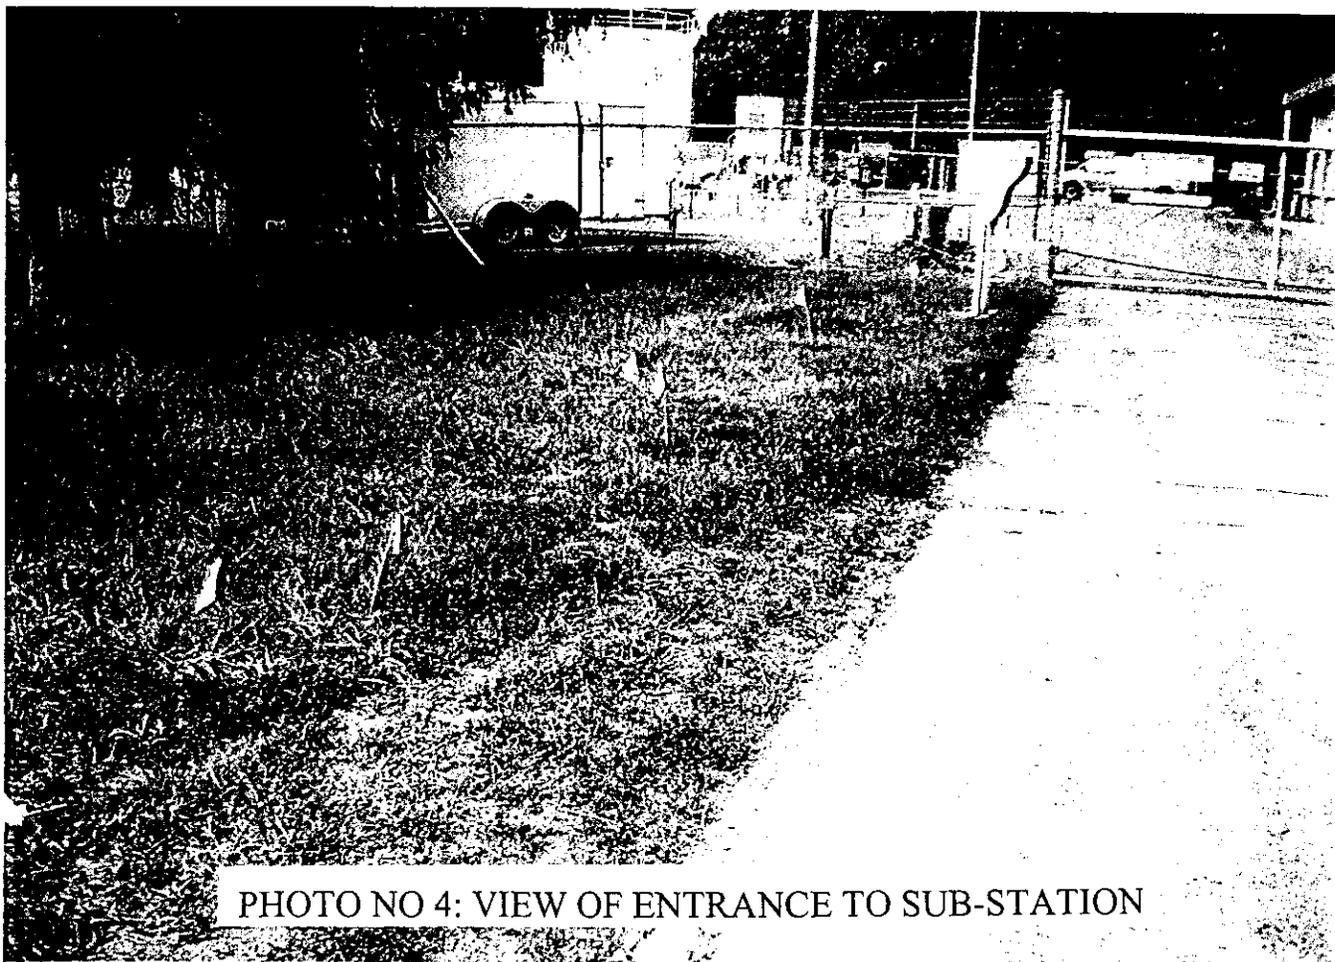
VIEW OF ENTRANCE TO SUB-STATION
